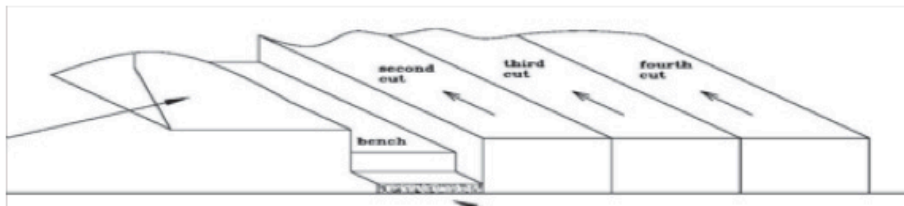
Dig the second trench and place overburden in the empty first trench
